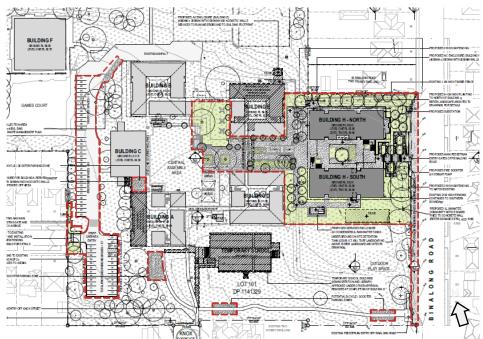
Extract of site plan with the location of the proposed works Source: Fulton Trotter Architects.
